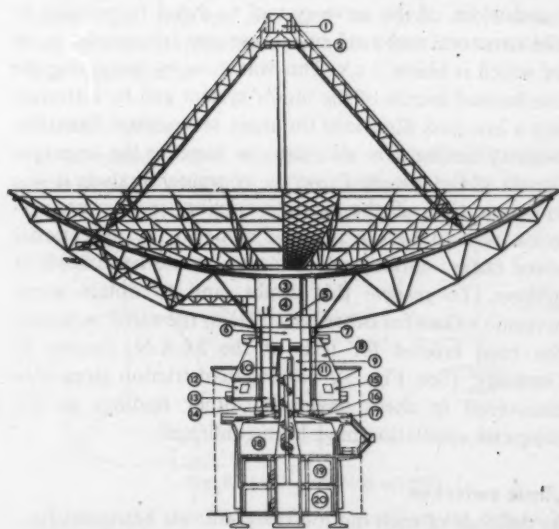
Sectional elevation on centre-line of altitude bearings. 1 Aerial cabin. 2 Aerial platform. 3 Vertex room. 4 Hub room. 5 Error detector. 6 Master equatorial room. 7 Altitude bearing. 8 Turret. 9 Junction room. 10 Ladder. 11 Turret access tower. 12 Motor room. 13 Counterweight. 14 Cable room. 15 Turret radio room. 16 Roller. 17 Roller track. 18 Control room. 19 Tower radio room. 20 Store.
